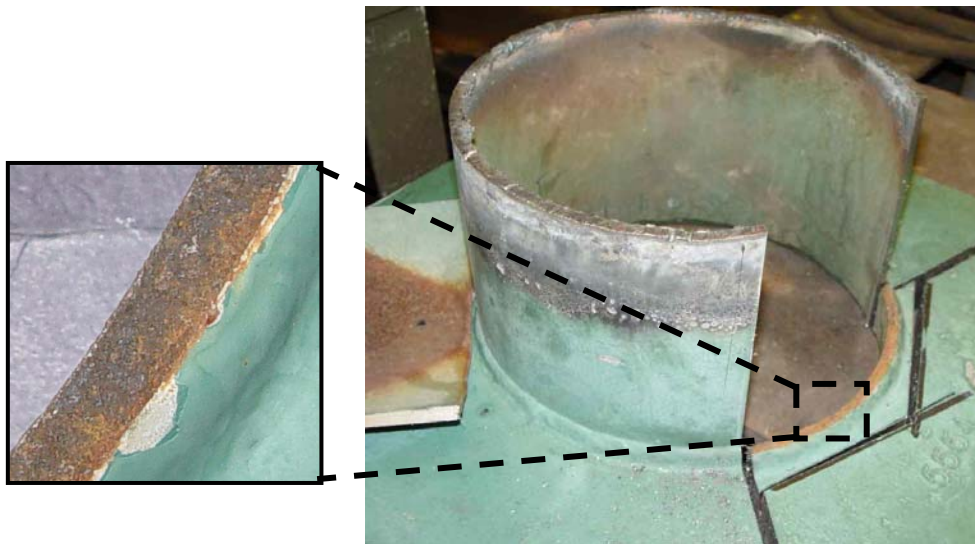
Cracked baseplate of painted pole with a close up on the highly corroded crack surface
